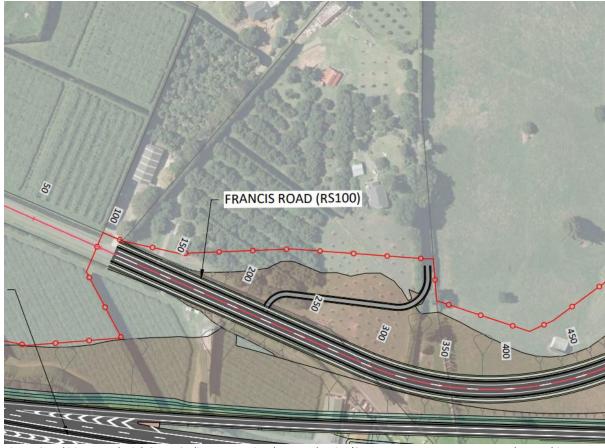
Takitimu North Link Stage 2 alignment as it relates to the site (Source: NZ Transport Agency Waka Kotahi, 'Drawing: General Arrangement Plan & Longsection Francis Road (RS100) Sheet 1', Drawing Number: 144702-00-1216, Date: 02.08.2021, Revision: P).
